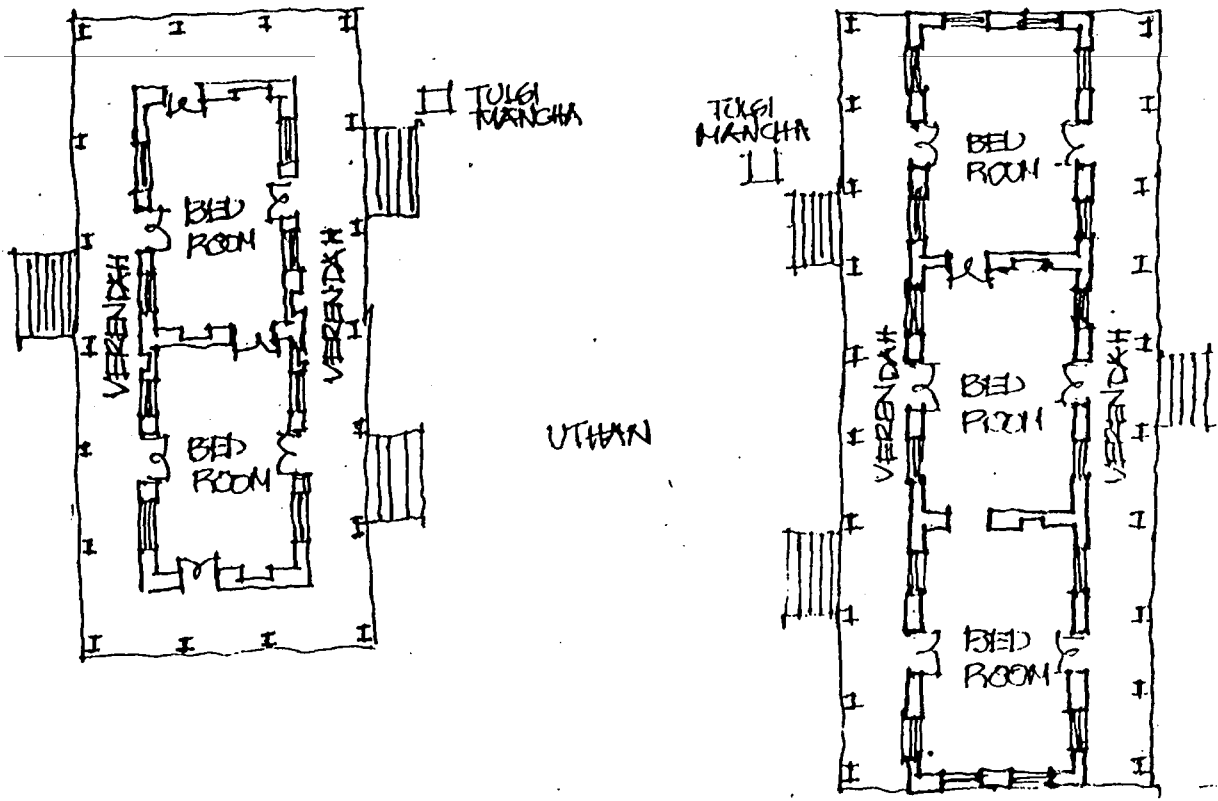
Ground floor plan house of Gagon Saha, Brahmanbaria
